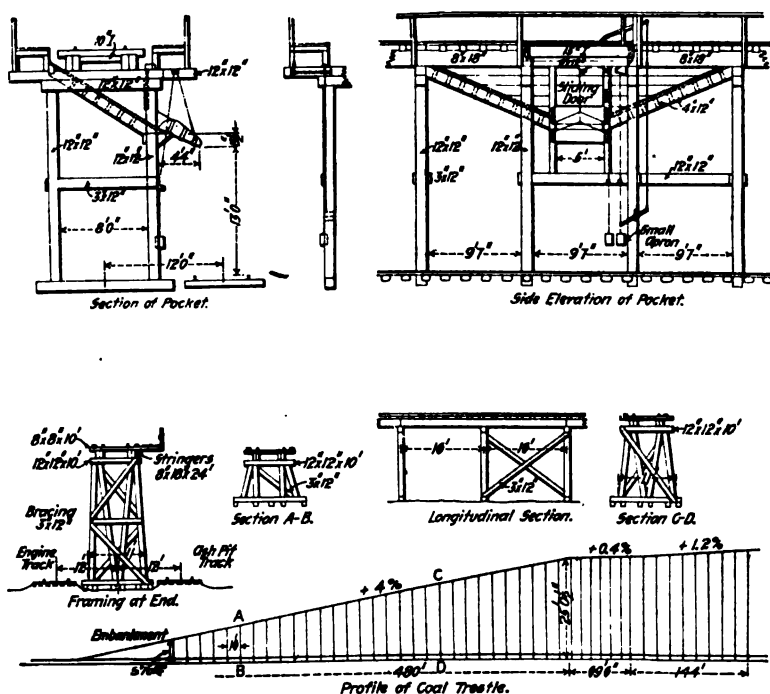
Standard coaling trestle—Pennsylvania Railroad.
